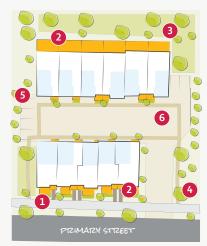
Example of a mid-block connection through a townhouse site, with building entries facing onto the path (3.1.3 d).
